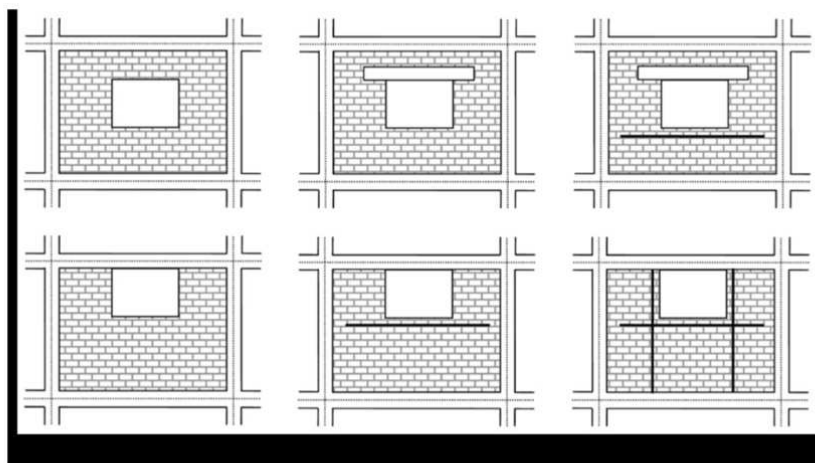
Types of reinforcement of infills around openings: (a) without reinforcement; (b) partial reinforcement; (c) complete reinforcement
